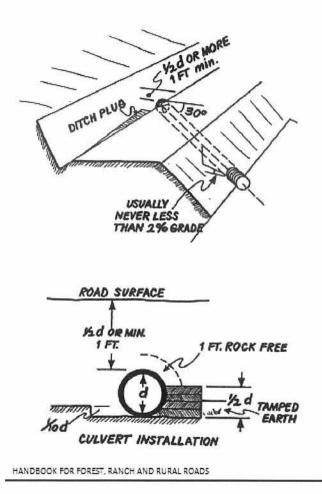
The elements of a properly installed ditch relief culvert. The culvert is angled at about 30 degrees to the road alignment to help capture flow and prevent culvert plugging or erosion of the inlet area. It is set at the base of the fill (ideally) or with a grade slightly steeper than the grade of the contributing ditch (but never with a grade less than 2 percent) (USDA-SCS, 1983). At a minimum, the grade of the ditch relief culvert should be sufficient to prevent sediment accumulation at the inlet or deposition within the culvert itself (it should be self-cleaning) (USDA-SCS, 1983).
